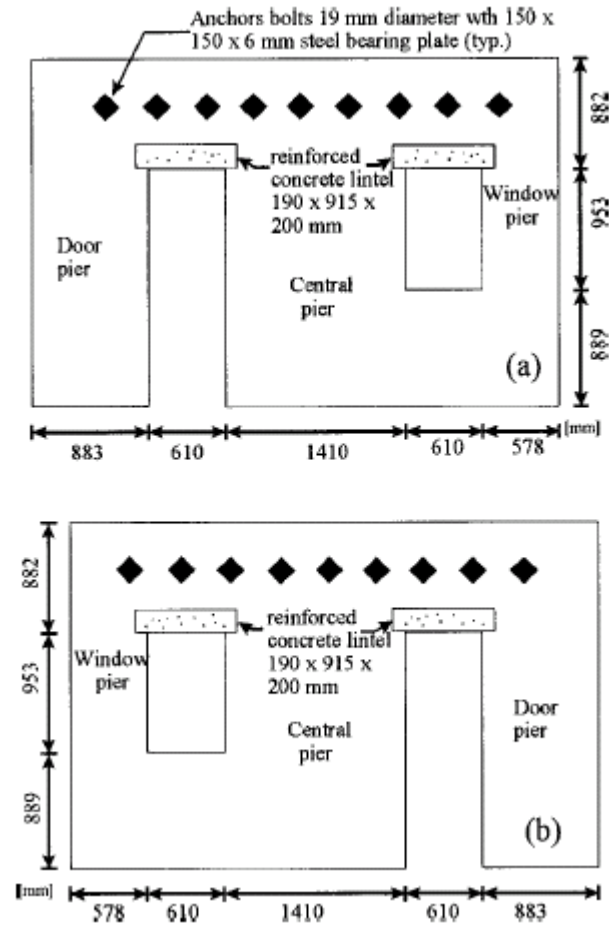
Elevation of (a) East wall and (b) West wall (taken from Paquette and Bruneau, 2003).
